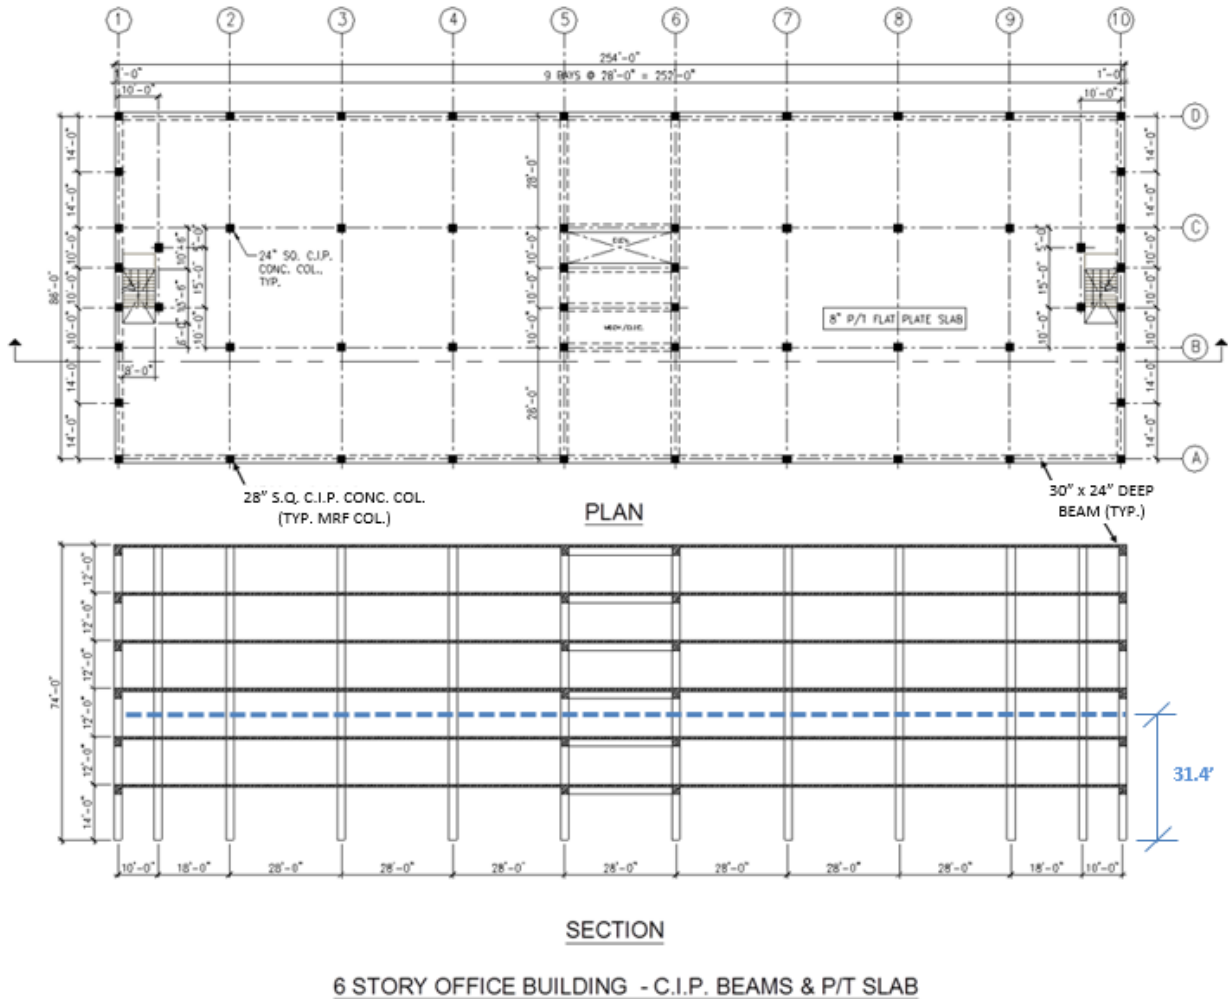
6 Story Office Building using Special Reinforced Concrete Moment Frame and posttensioned flat slab supported on gravity columns
